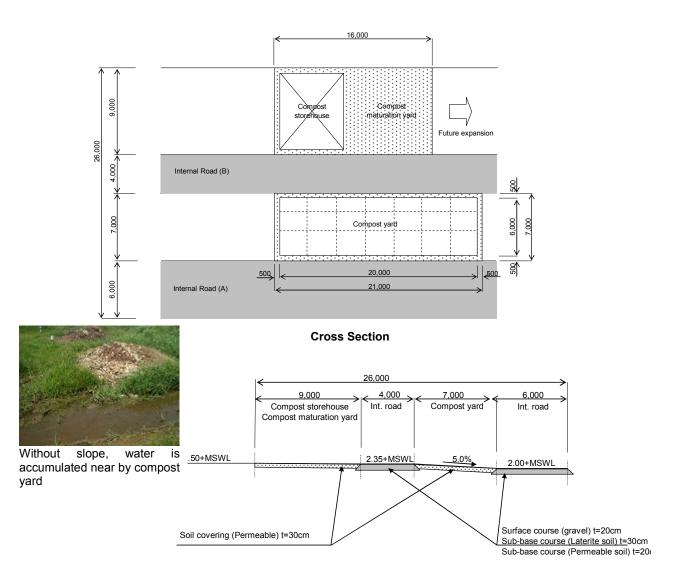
Layout of compost yard (Vunato disposal site, Lautoka)
